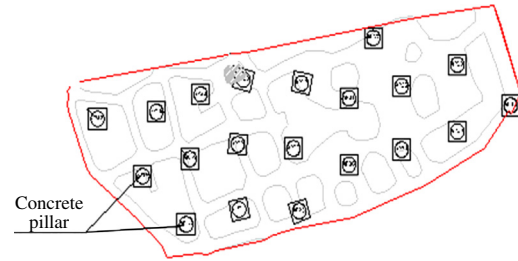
Layout of concrete pillars between remained pillars in Fetra6 underground mine.
